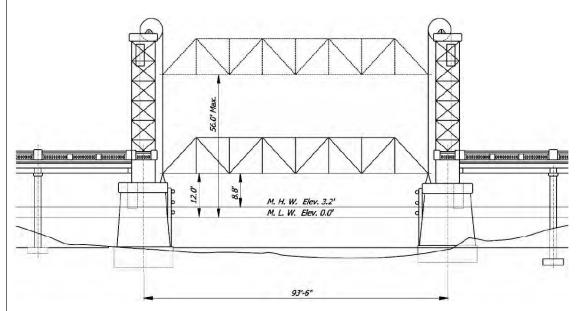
Bridge elevation view for a vertical lift bridge indicating vertical clearances. (Source: Florida DOT)
